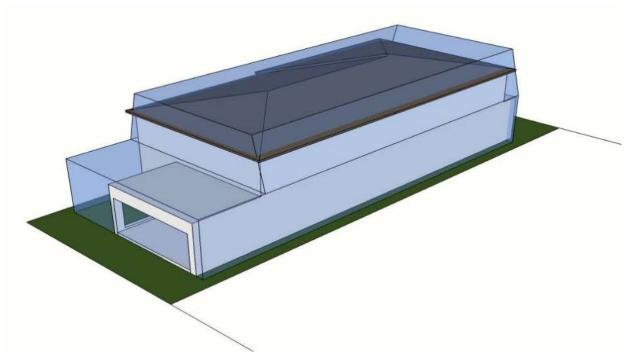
MAXIMUM DEVELOPMENT POTENTIAL WITH NO GROSS FLOOR AREA CONTROL – ONLY LANDSCAPED AREA STANDARD AND SITE AND REAR SETBACKS
